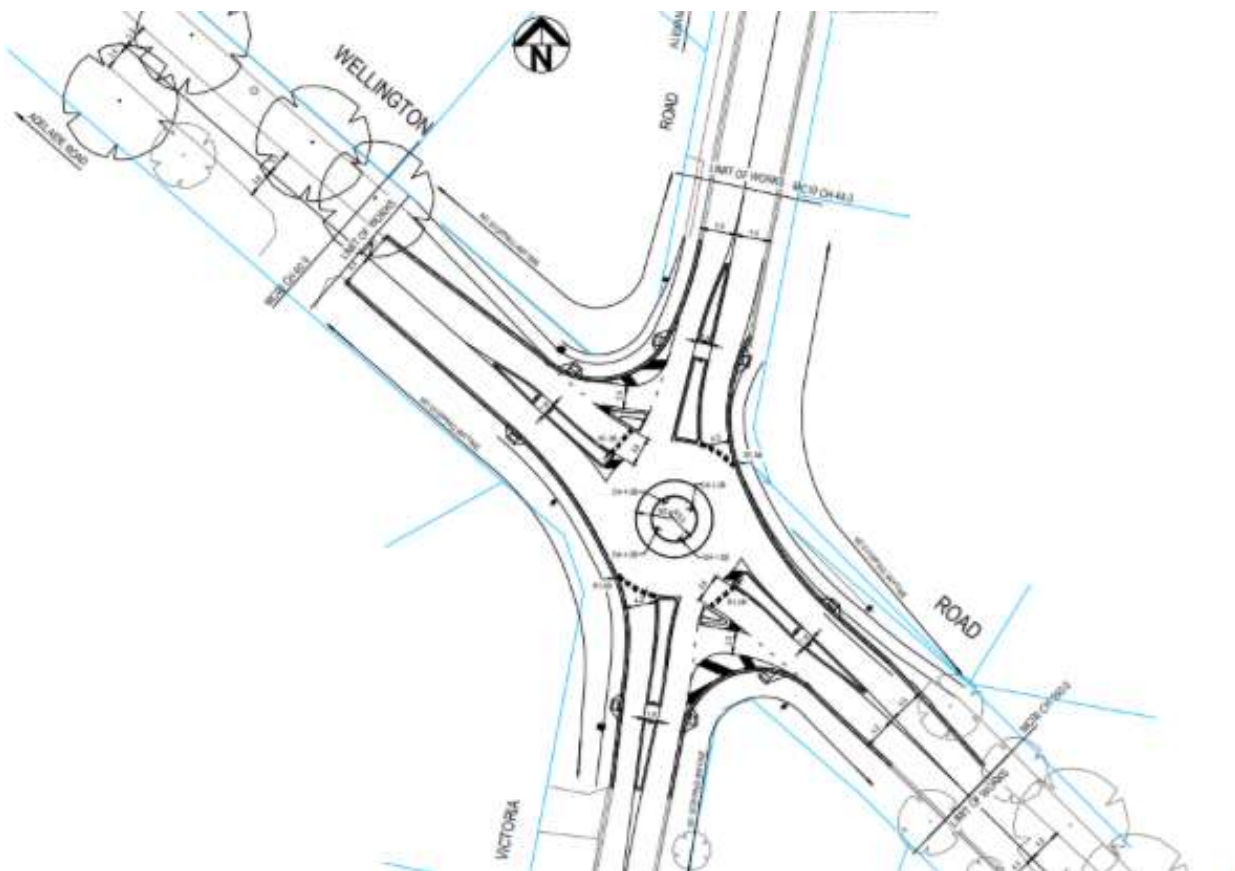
Roundabout design for the intersection of Wellington Road and Victoria Road¹¹
